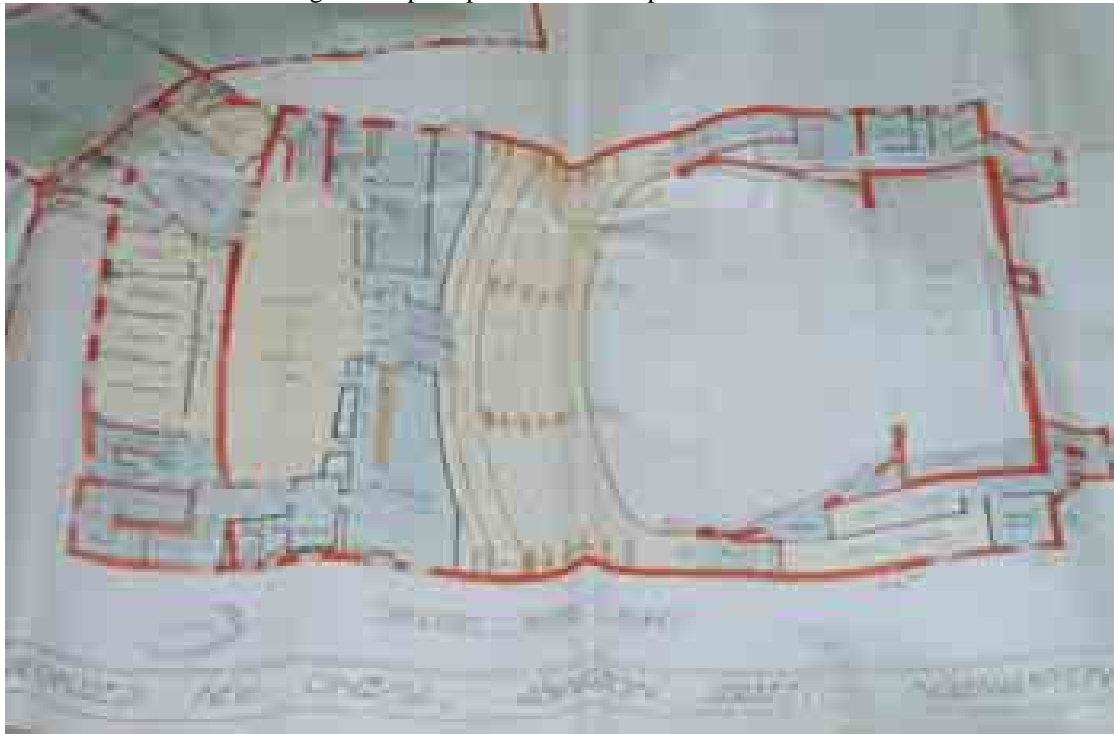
Deposit plans: balcony foyer level NRO Y327
